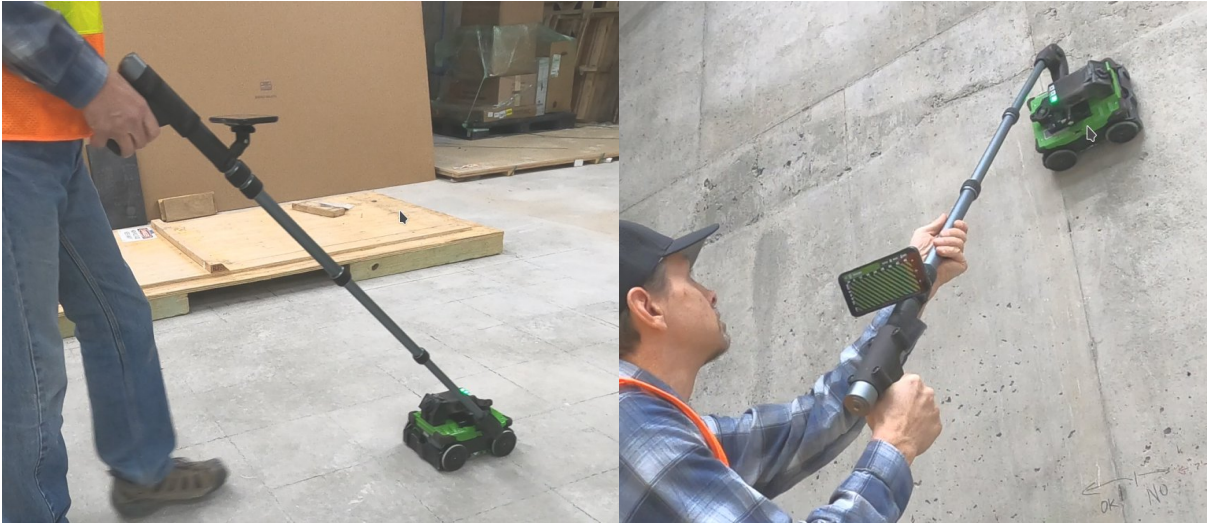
Using the wheel truck and extension handle for a floor survey (left) and a wall survey (right).
